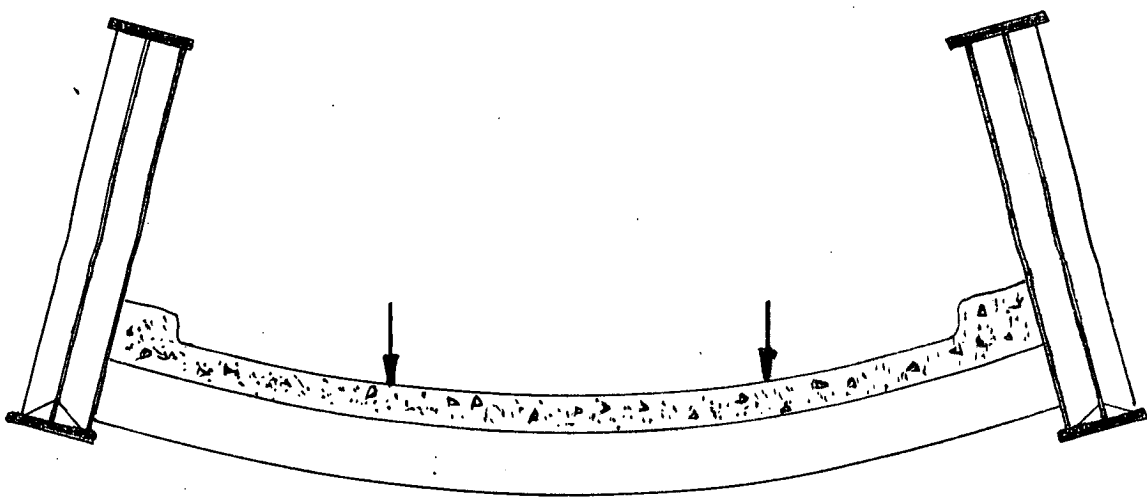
Deformations of the bridge resulting from a method of loading other than through the centroid of the I beam sides. In this case the loading was applied by driving a loaded fork lift truck on to the bridge.
